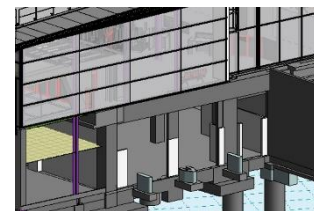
Gaps between the rotunda of the boarding bridge and the façade
